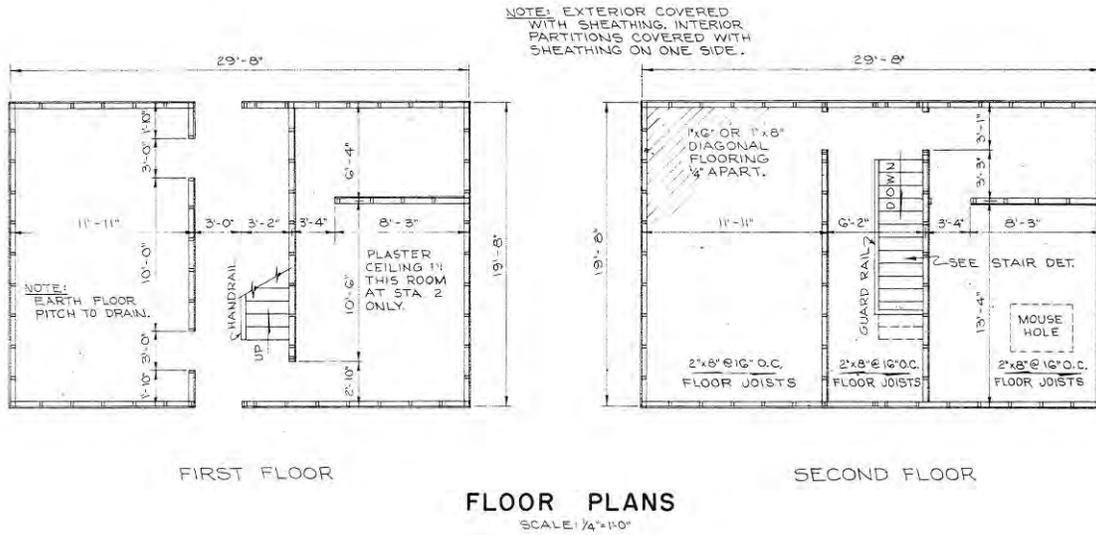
"Combat in cities" course type "B" building floor plans, 1952 (standard drawing 28-13-01 sheet 4 of 9; "Combat in cities" course, type "B" building, plans, elevations, and details; 20 June 1952).
